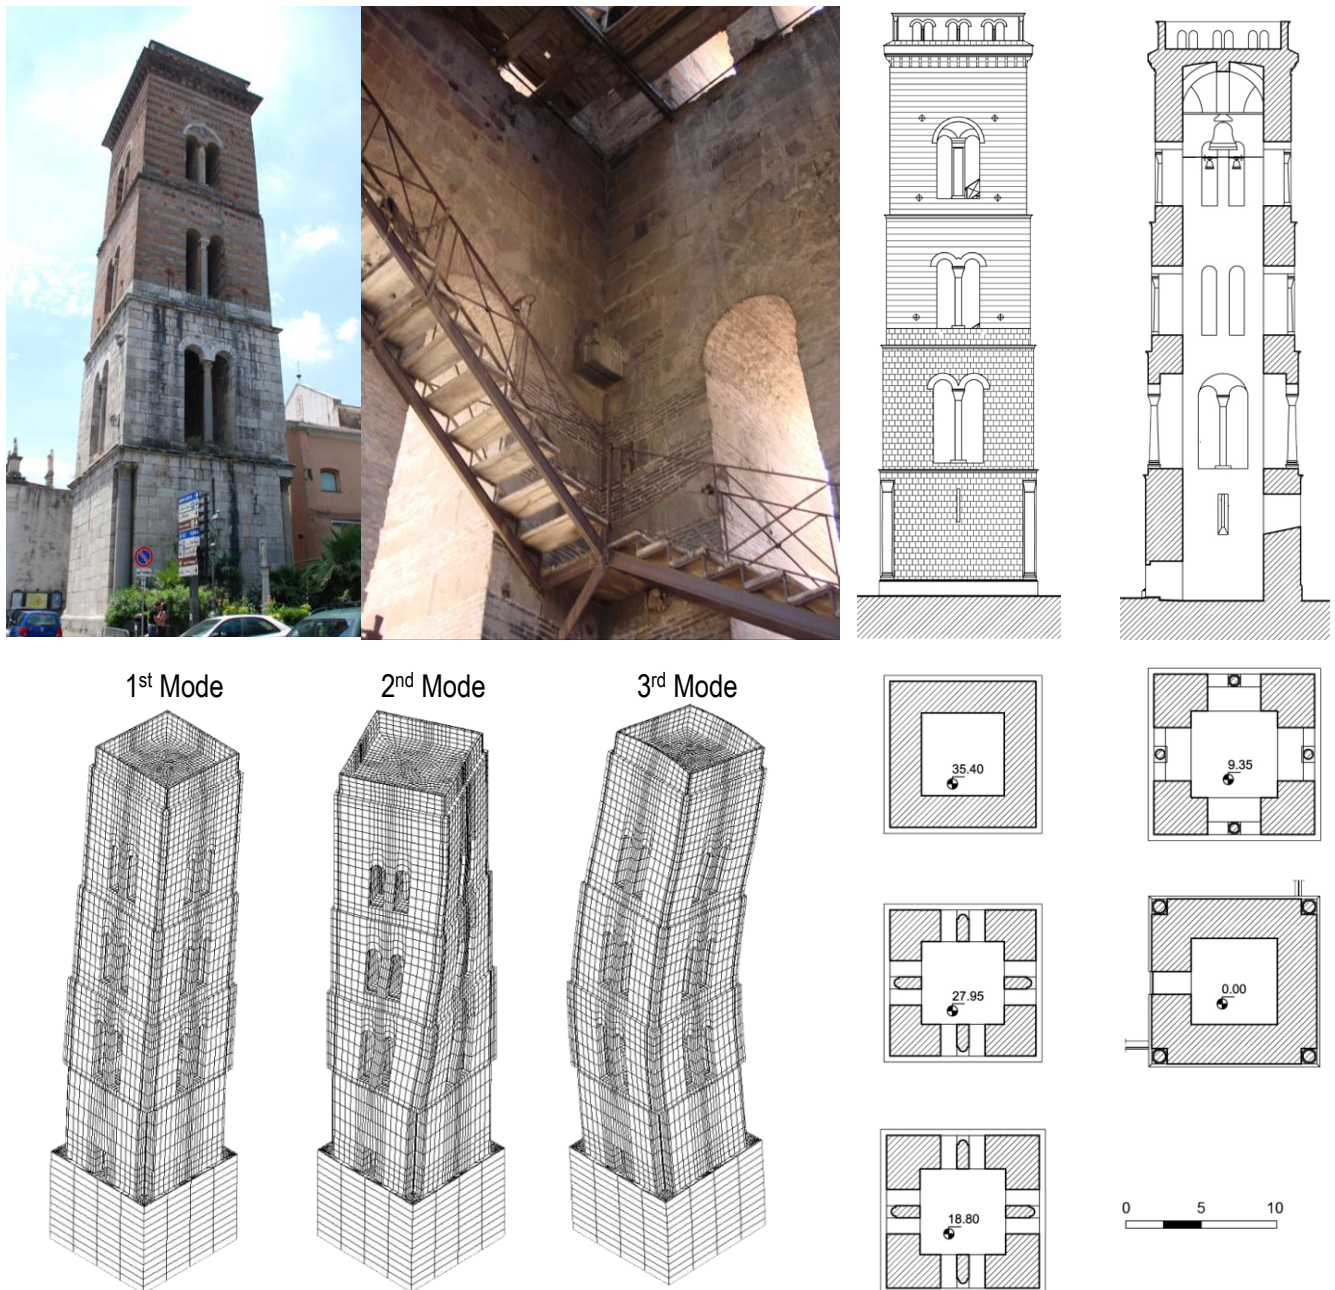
The bell tower of the Cathedral of Capua: general view, internal view, façade, sections, mode shapes
